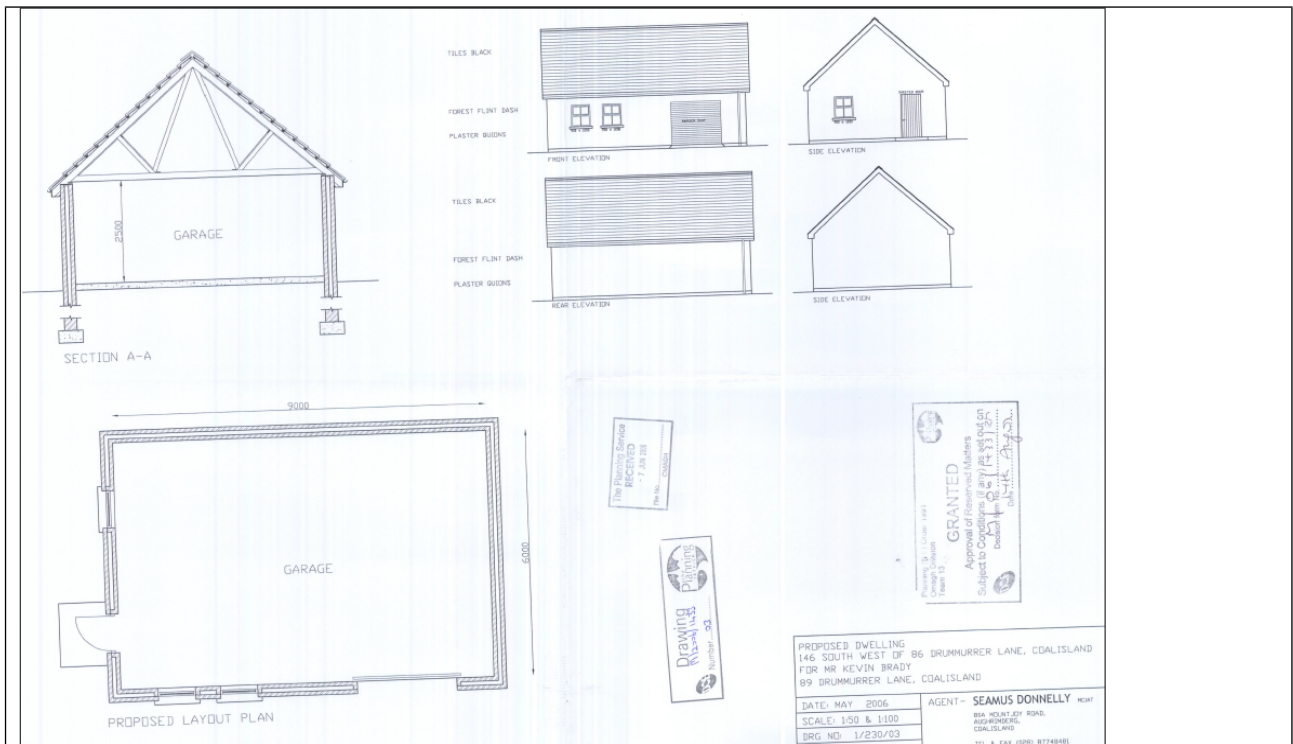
Floor plan and elevations of garage approved under M/2006/1433/RM
